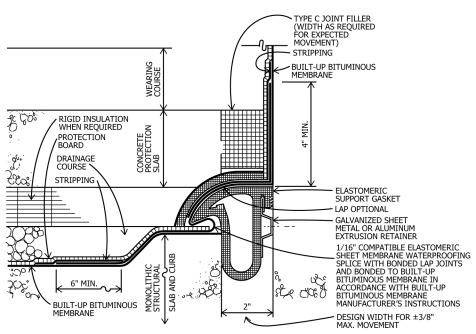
Water Shed Concept Expansion Joint (see also 8.8.7.2 and Fig. 4)
